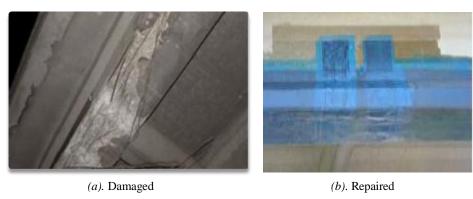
Damaged and repaired prestressed concrete girder
